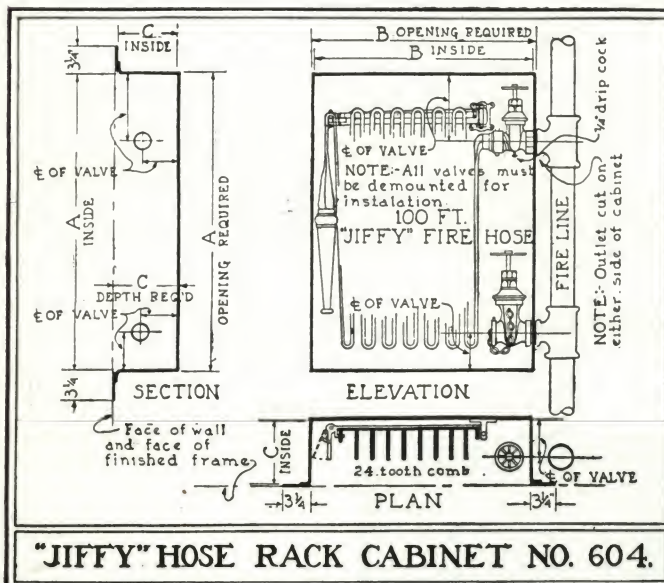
Furnish (and install) where shown on the drawings, a "Jiffy" Fire Hose Cabinet, No. 604, constructed of No. 16 gage steel, with No. 12 gage steel trim and door having polished plate glass panel, concealed hinges, concealed catch and pull handle. Finished at factory with a priming coat of white paint.
